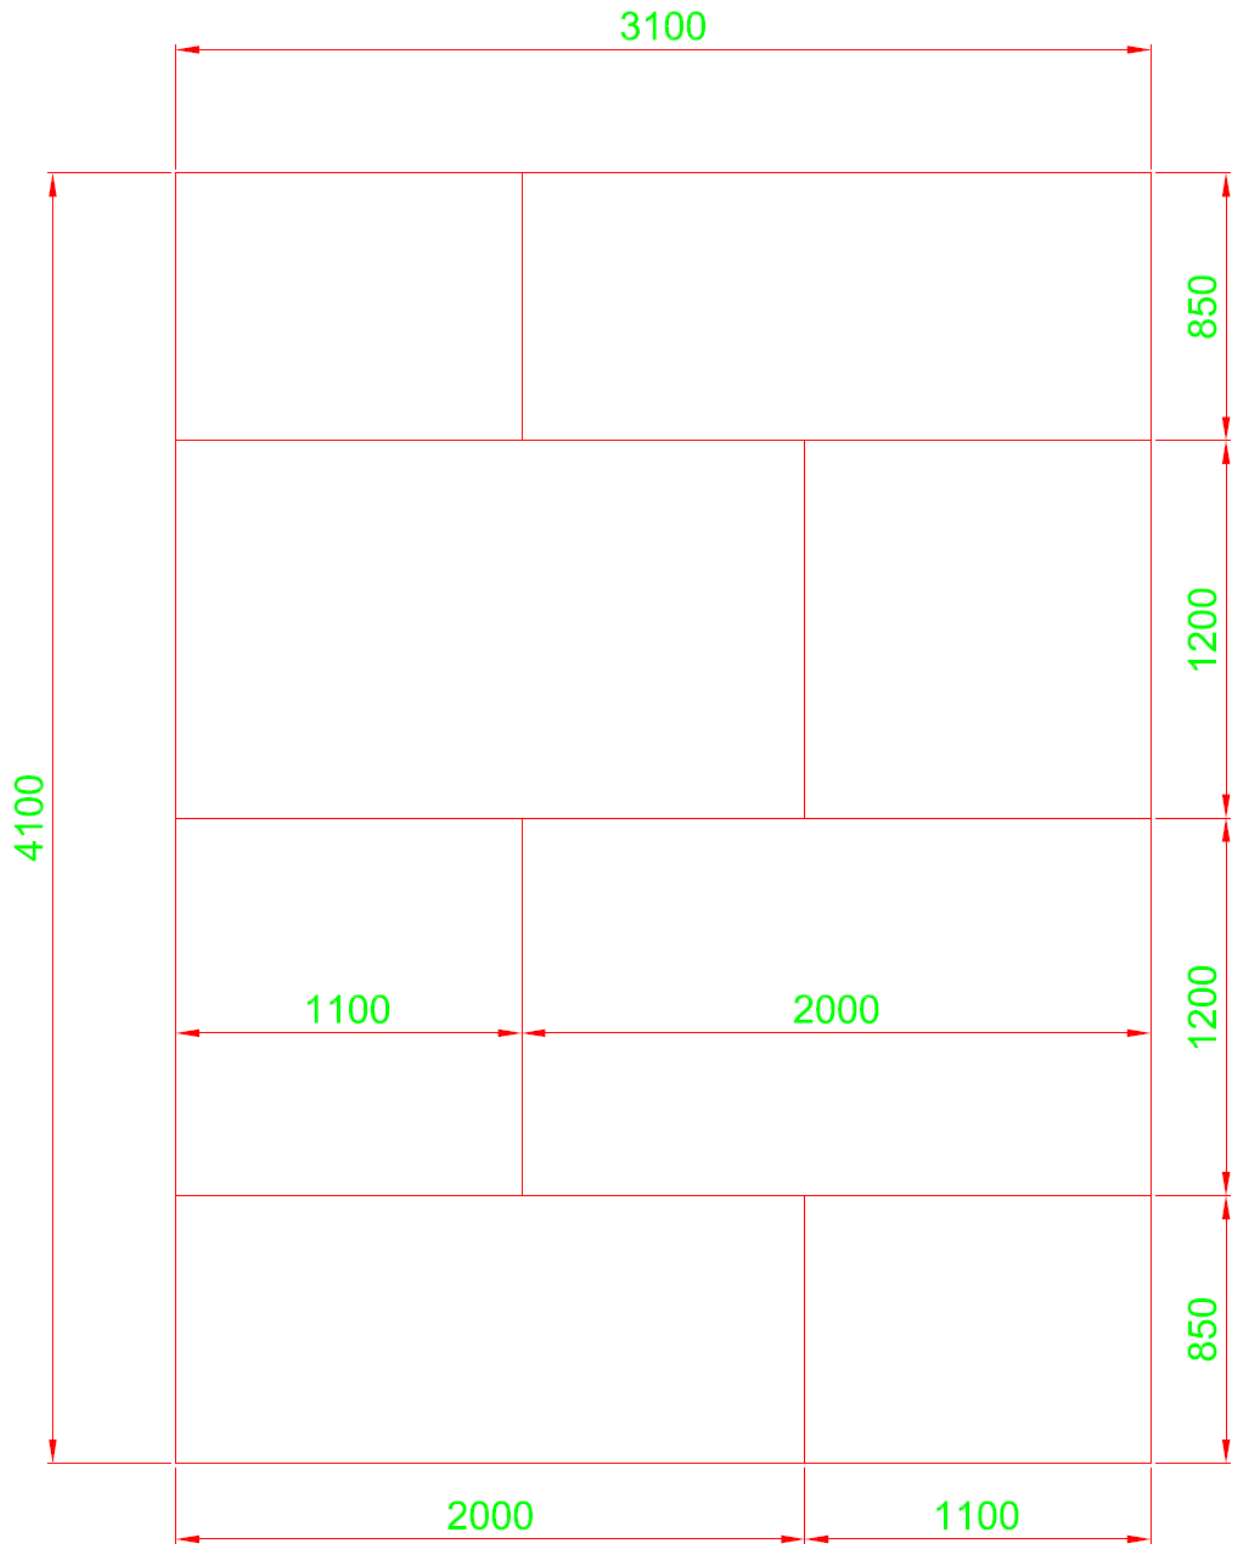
First (Inner) layer view of exposed side of the test specimen.
